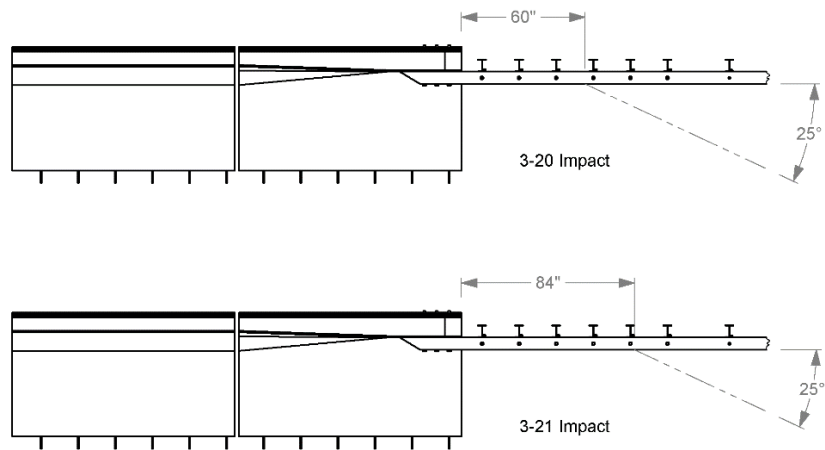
Target CIP for *MASH* TL-3 Tests on Box Beam Guardrail Transition to Concrete Parapet.
